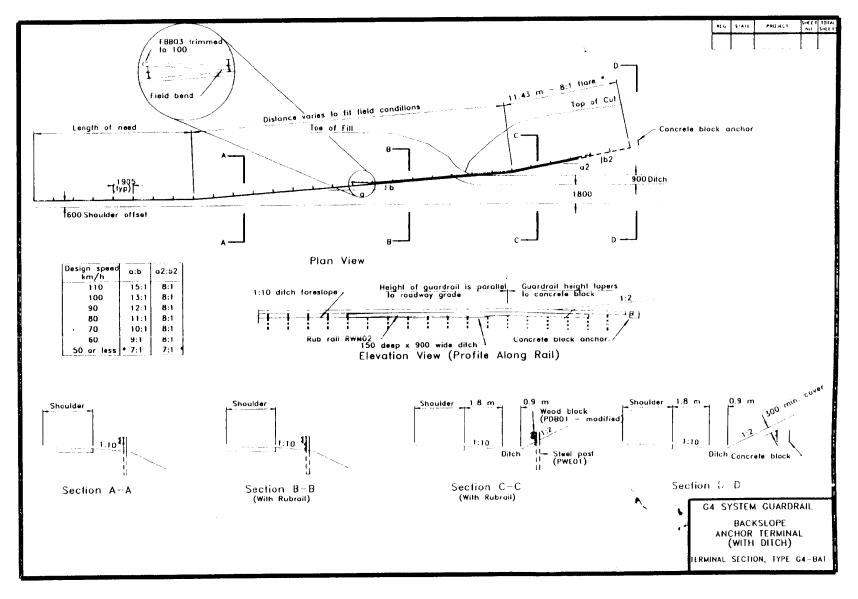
Details of the W-beam guardrail buried-in-backslope (with ditch) installation.
